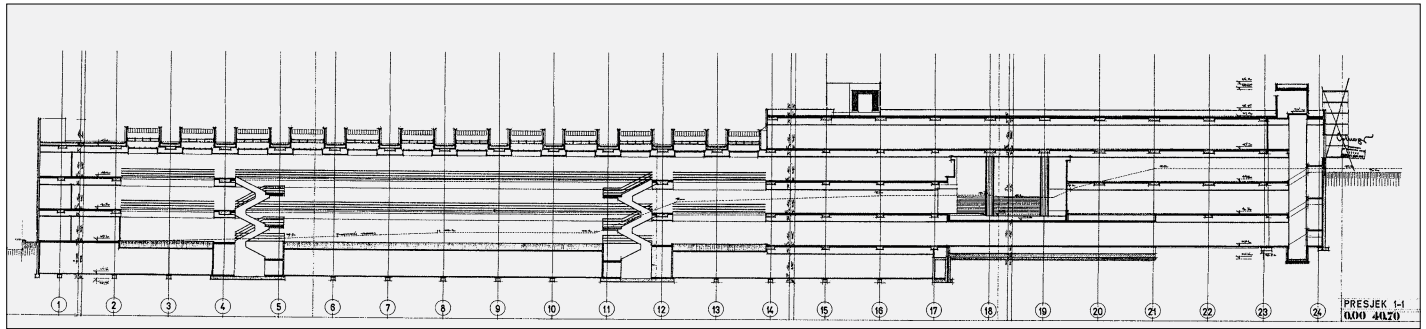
LONGITUDINAL SECTION 1-1 THROUGH THE BRODOMERKUR OFFICE BUILDING, AUTHOR DANKO COLNAGO
